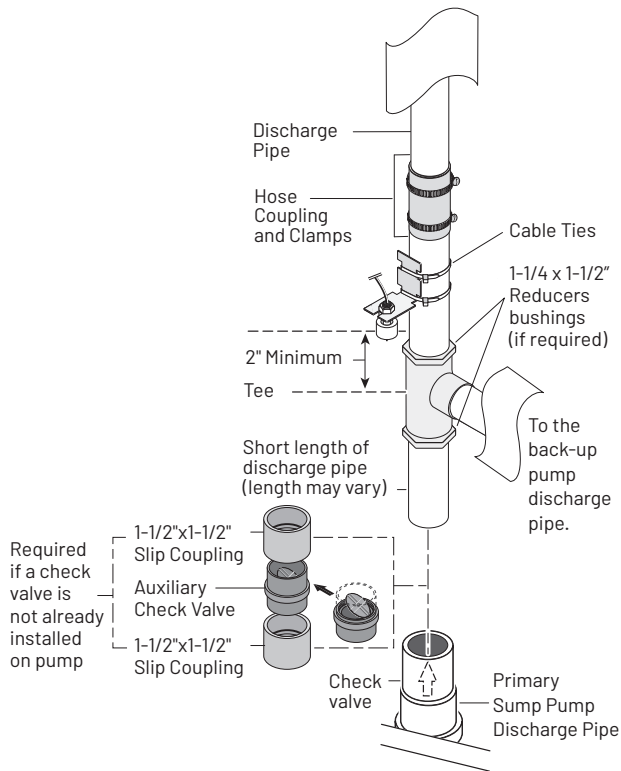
BACK-UP PUMP FLOAT SWITCH
